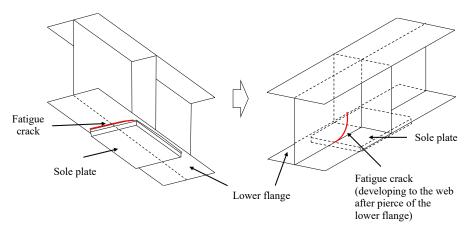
Fatigue Crack at the Welding Part of Sole Plates
